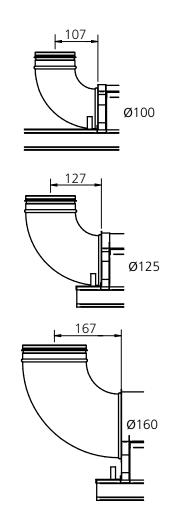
Dimensional drawing – vertical air connection with duct beneficial
